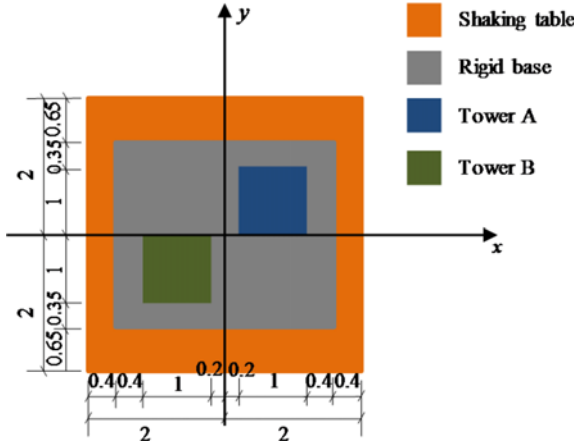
Layout of the twin-tower connecting structural model and shaking table (unit: m)
